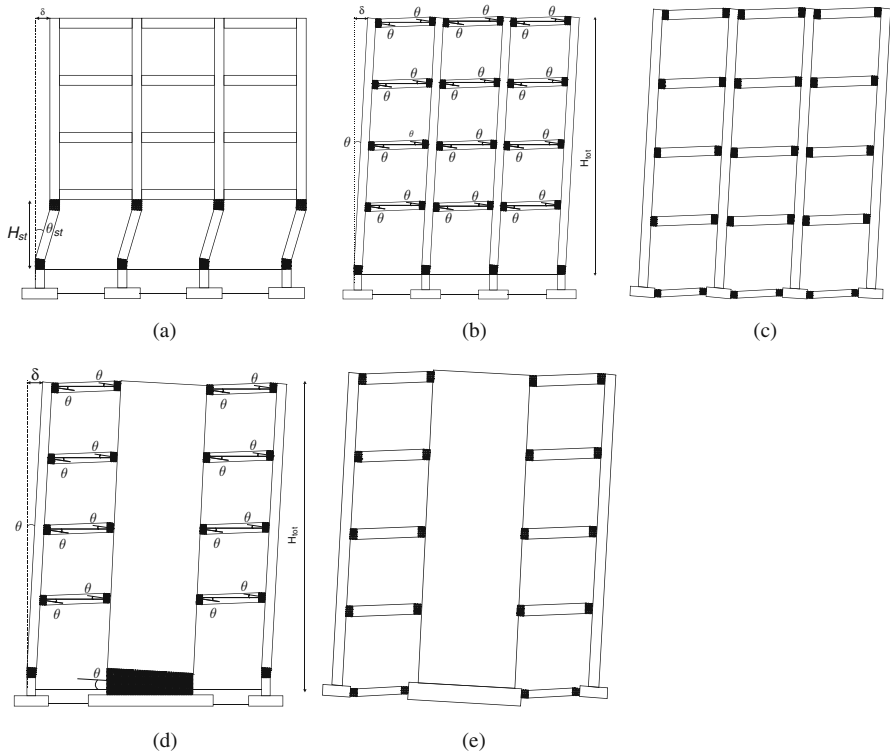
Plastic mechanisms in frame and wall systems: (a) soft-storey mechanism in weak column/strong beam frame; (b), (c) beam-sway mechanisms in strong column/weak beam frame; (d), (e) beam-sway mechanisms in wall system
